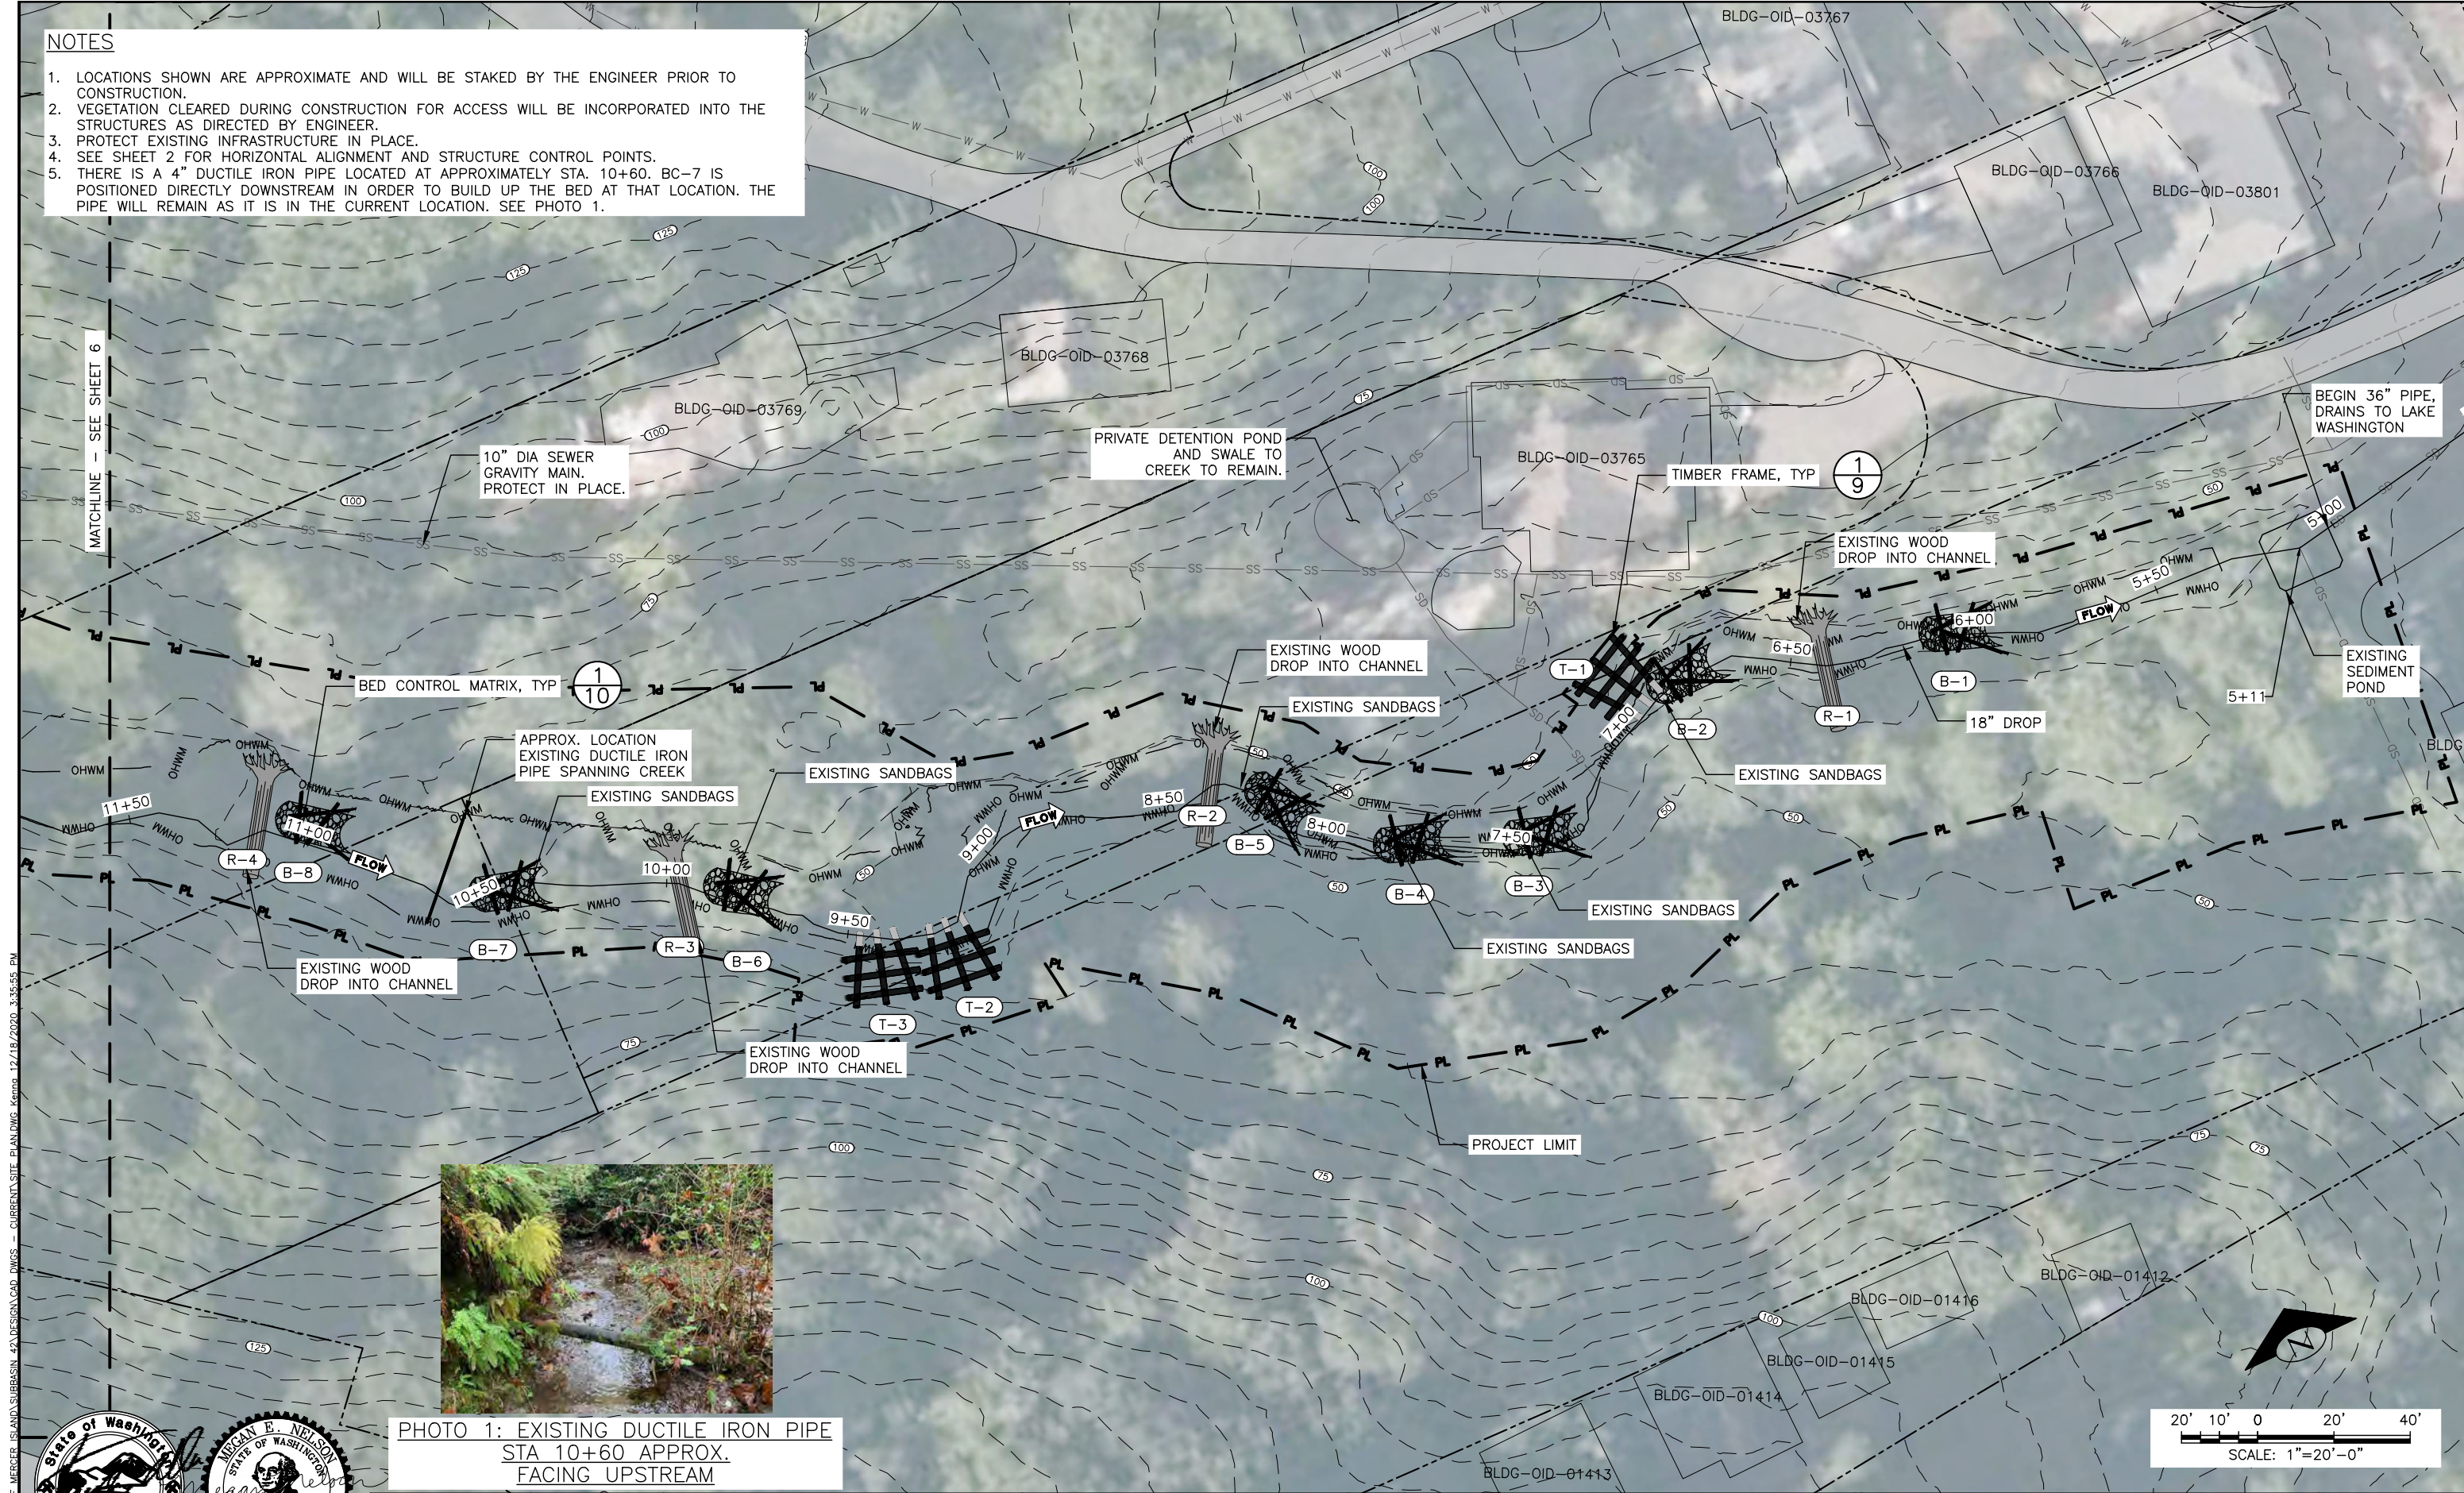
EXISTING DUCTILE IRON PIPE STA 10+60 APPROX. FACING UPSTREAM
